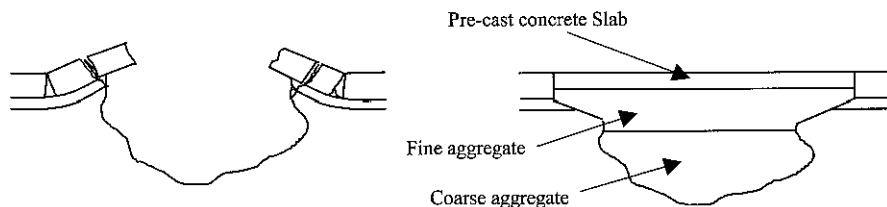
Repair of Standard Heave Crater with Pre-cast Concrete Slab
